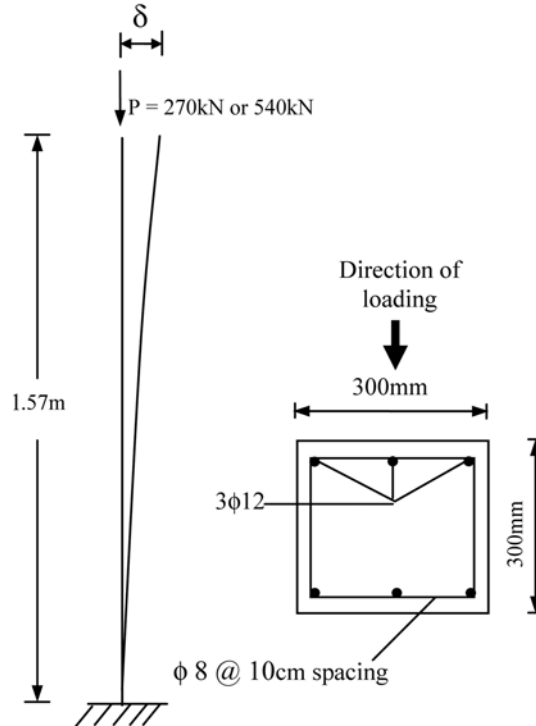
Reinforced concrete column subjected to axial load and lateral displacement
